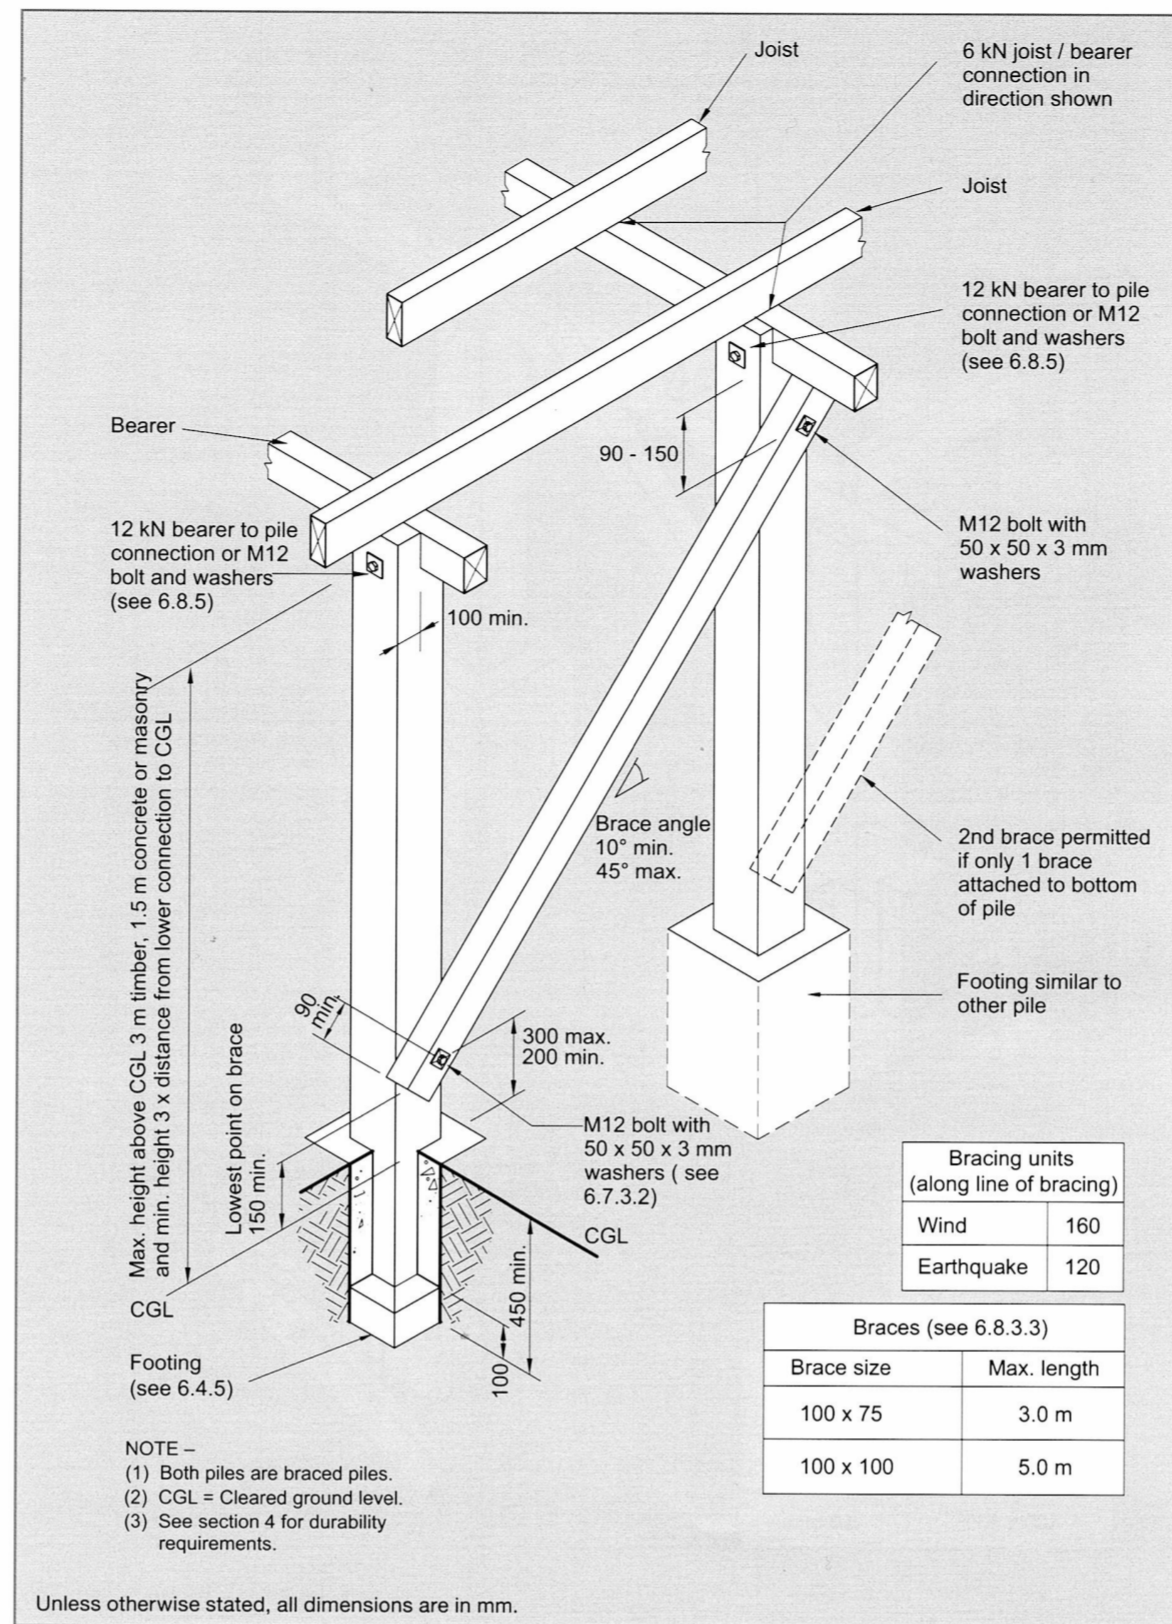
Braced pile system – Brace connected to pile (see 6.8)
